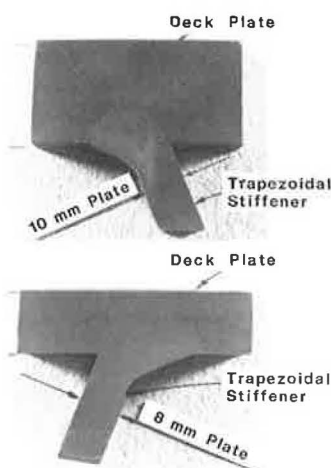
Enlarged etched cross sections of trapezoidal stiffener web to deck plate connection.
